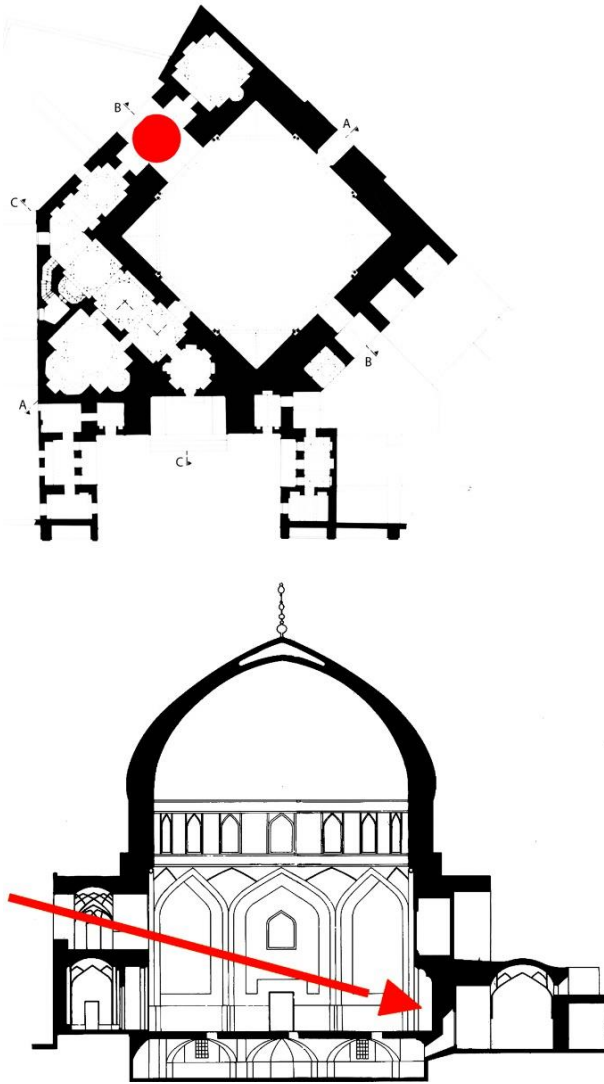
The Gigantic Opening on the Northern Wall of the Dome Hall
